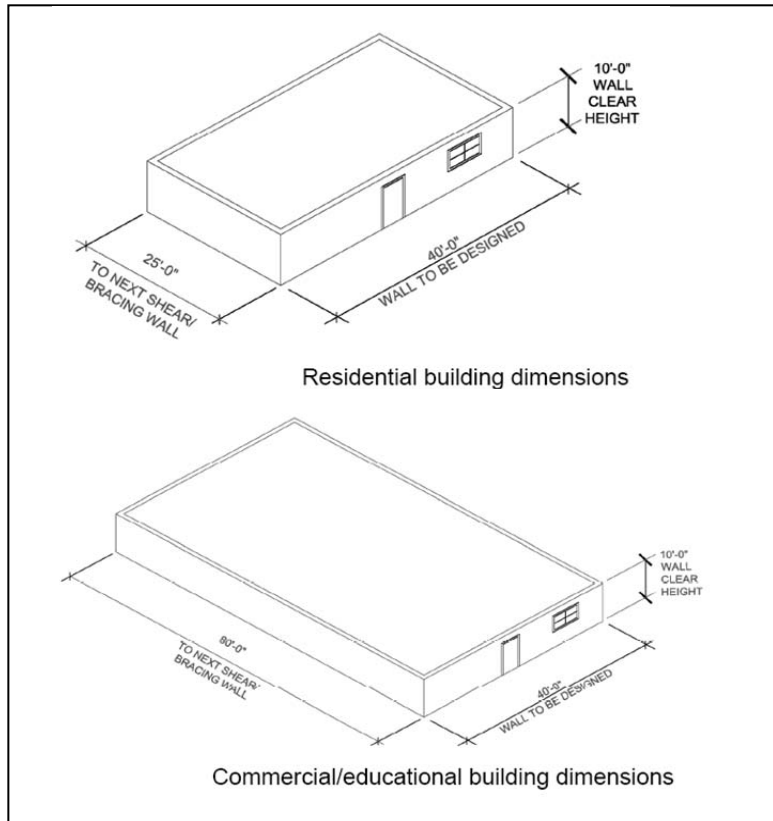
Archetype Building Dimensions (Source: FEMA, 2009)
